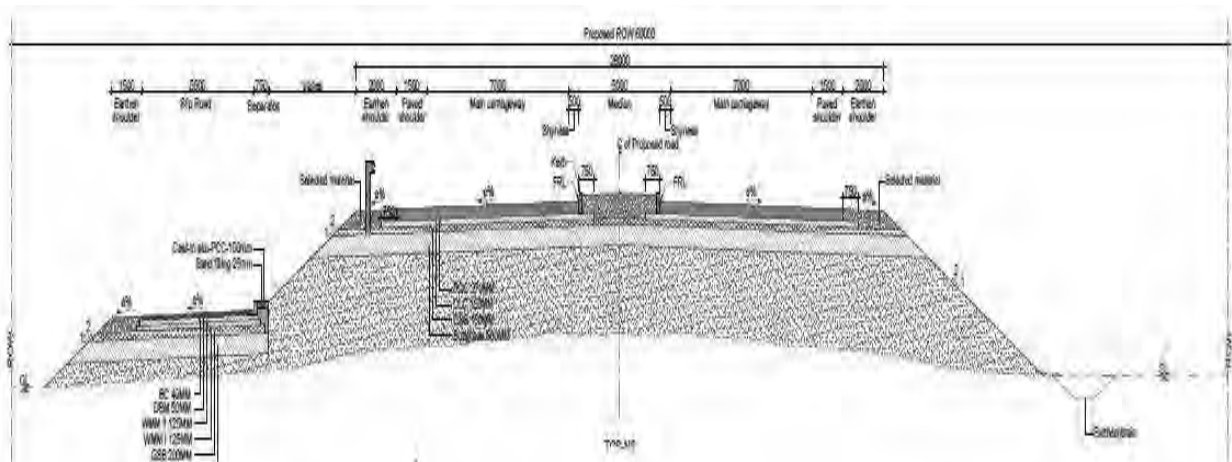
TCS-N2 Typical Four Lane Underpass Cross Section with Slip Roads in Bypass & Realignment
